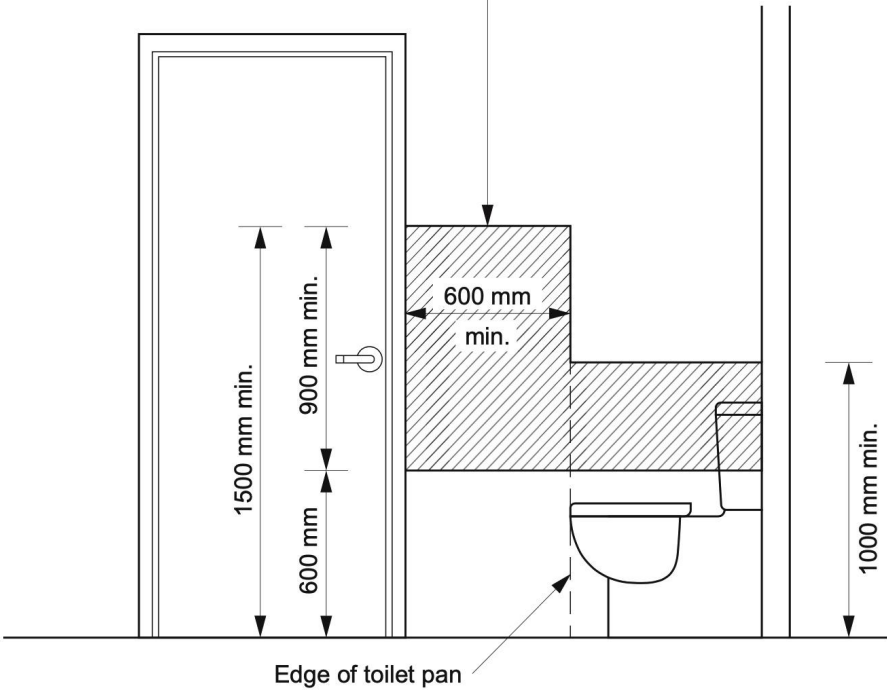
Location of noggings for a wall behind a toilet pan
